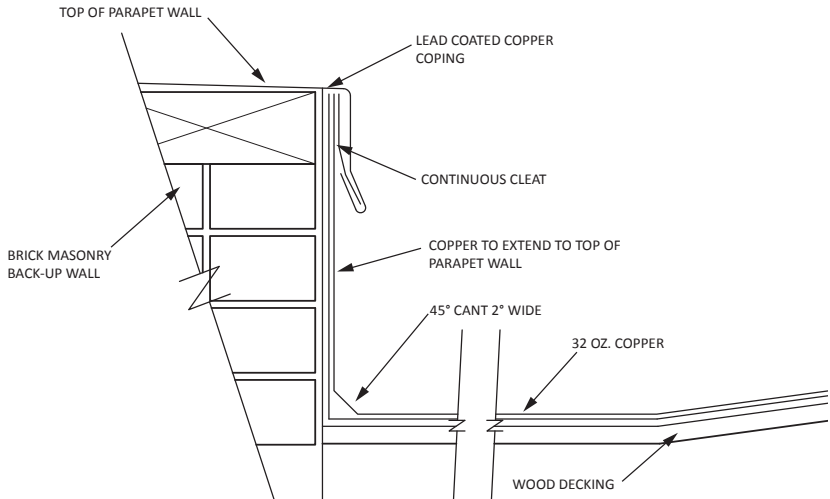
Proposed Treatment Detail at Parapet Walls.
